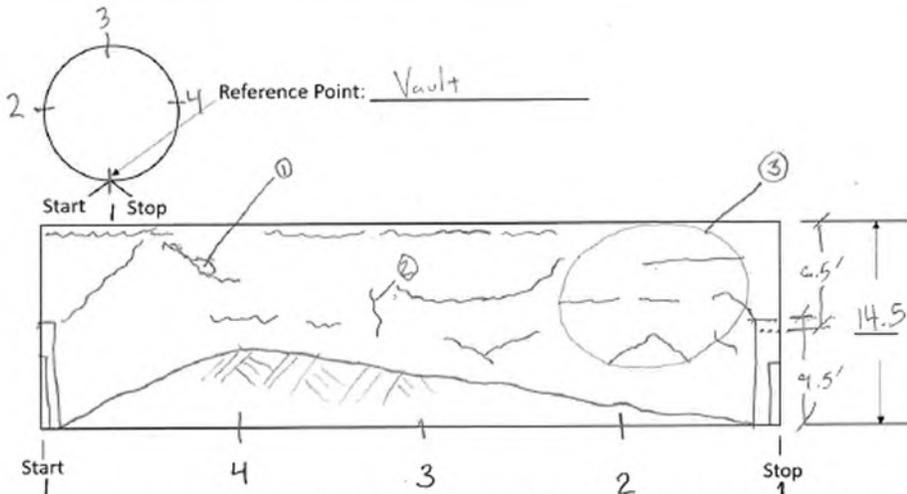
Reservoir EXTERIOR WALL Elevation– Note location of ladders and other features.
